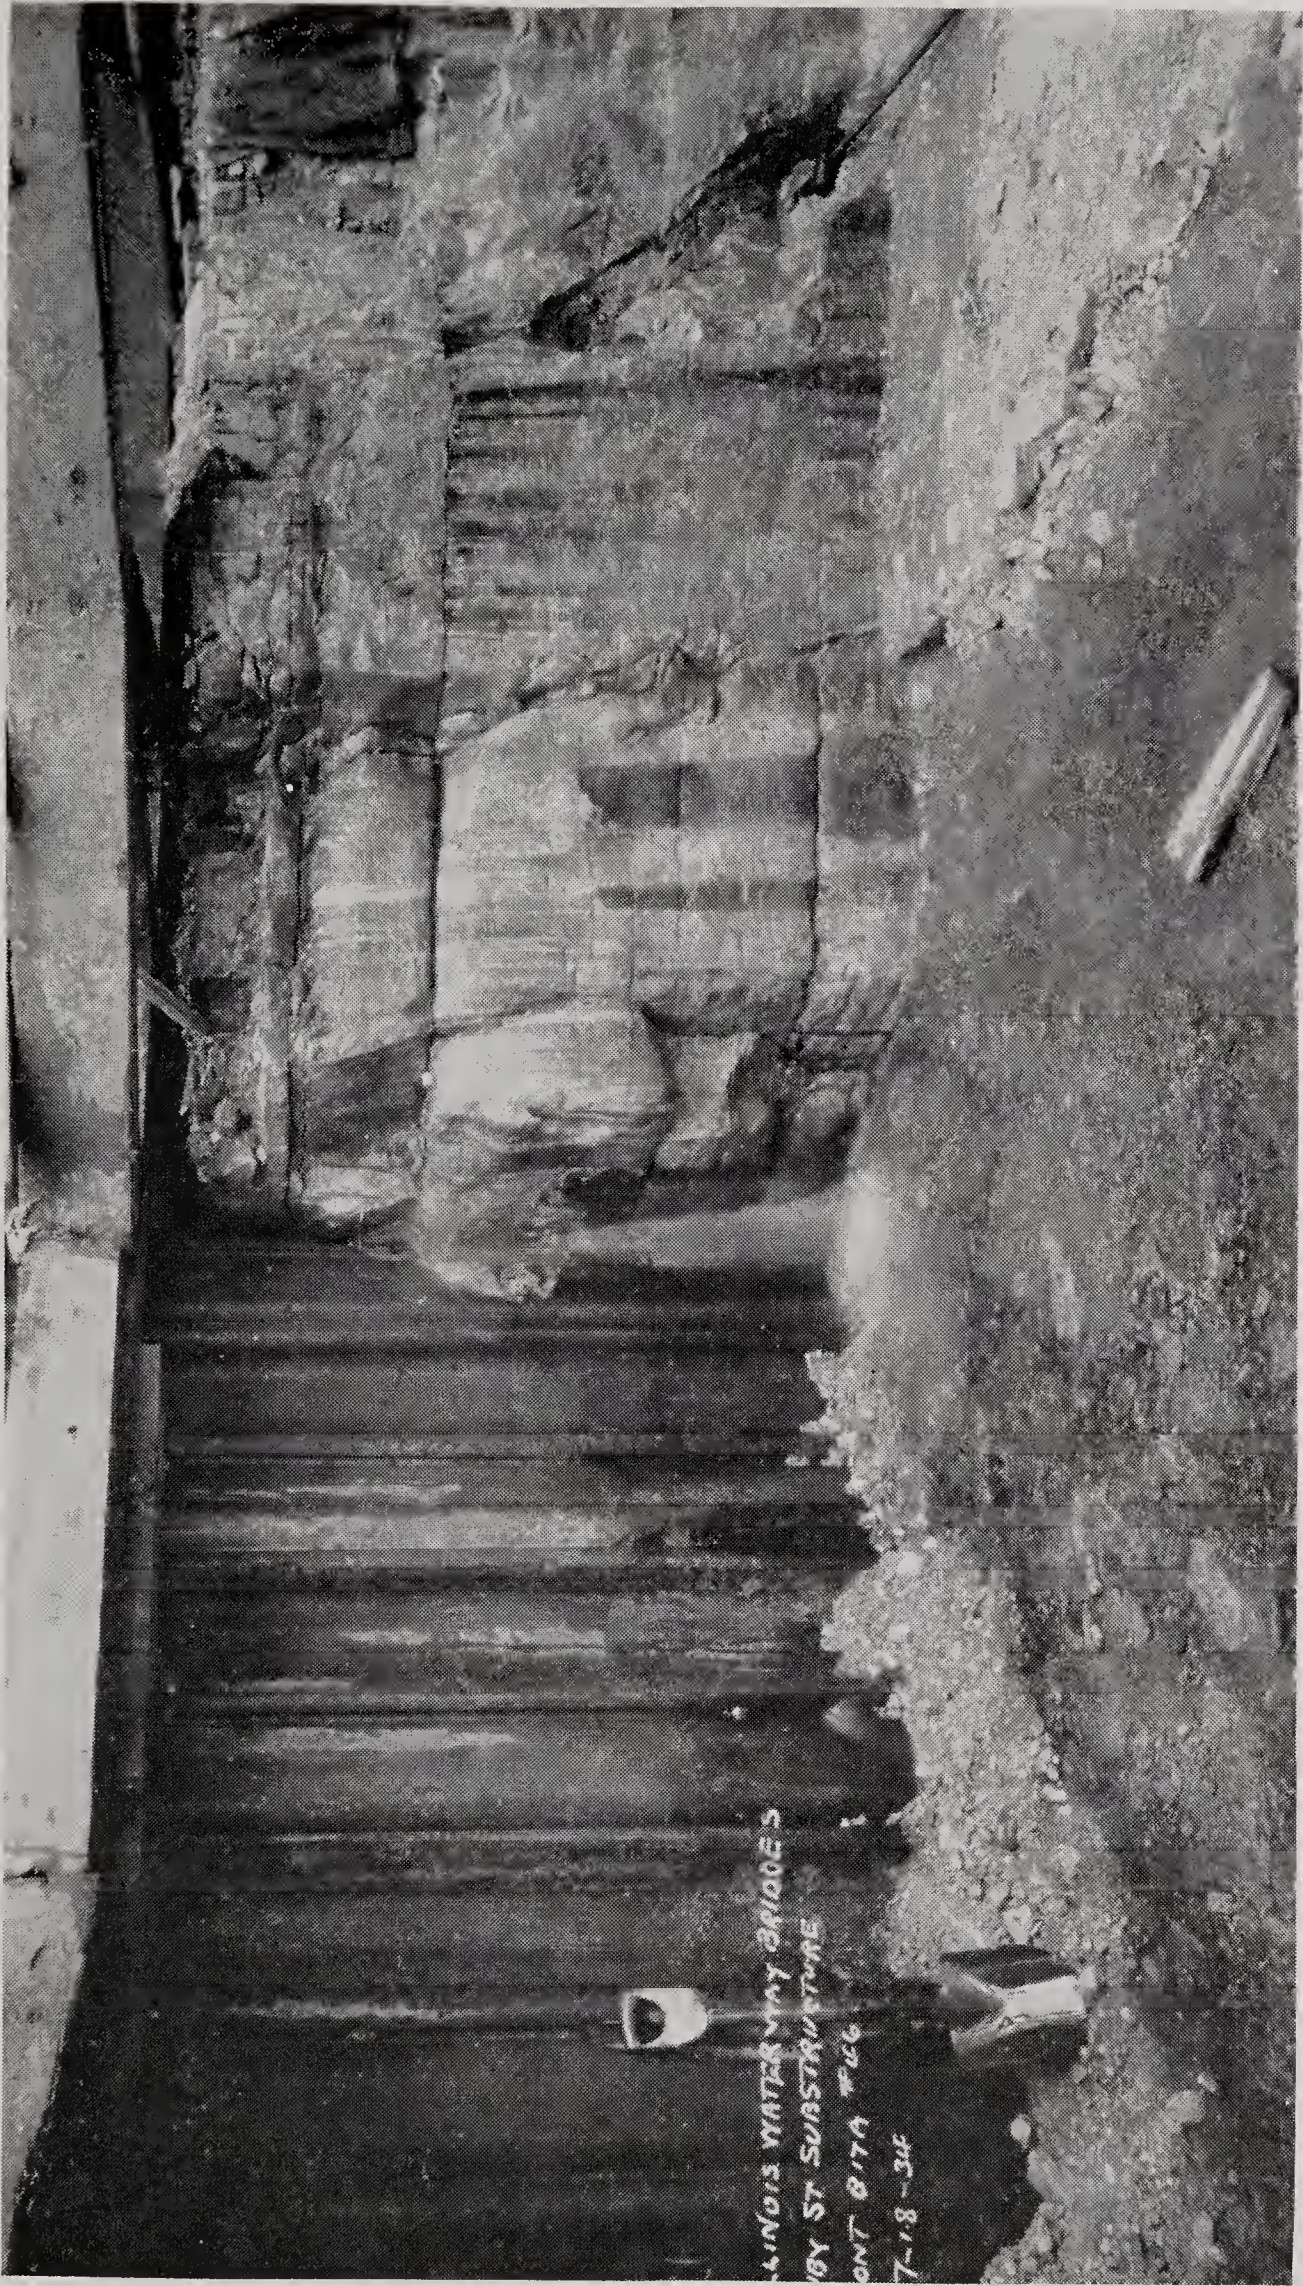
Ruby Street Bridge, Joliet. Rock formation at site of East Pit.
